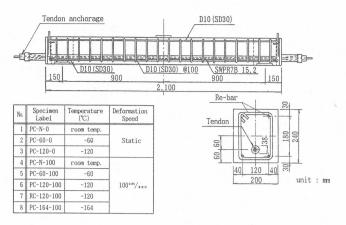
Dimension and Re-bar Arrangement of Prestressed Concrete Beams for Flexure Test with Impact Loading
